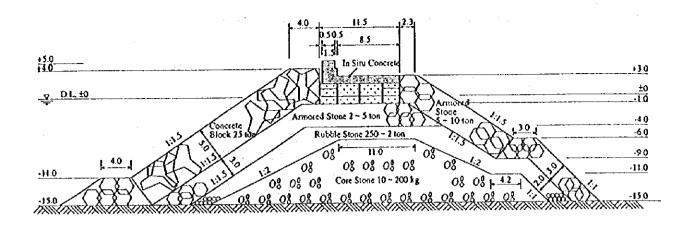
Standard Cross Section of Breakwater Rubble Mound Type (-15.0m)
